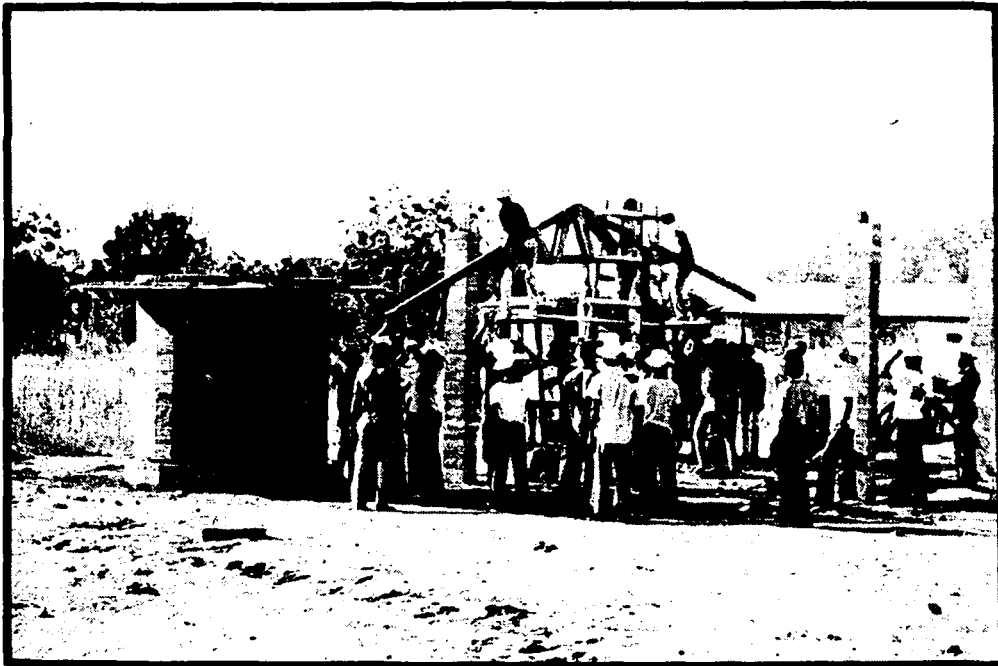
Trainees hoist the roof beam atop reinforced pillars to build the catchments hangar.
